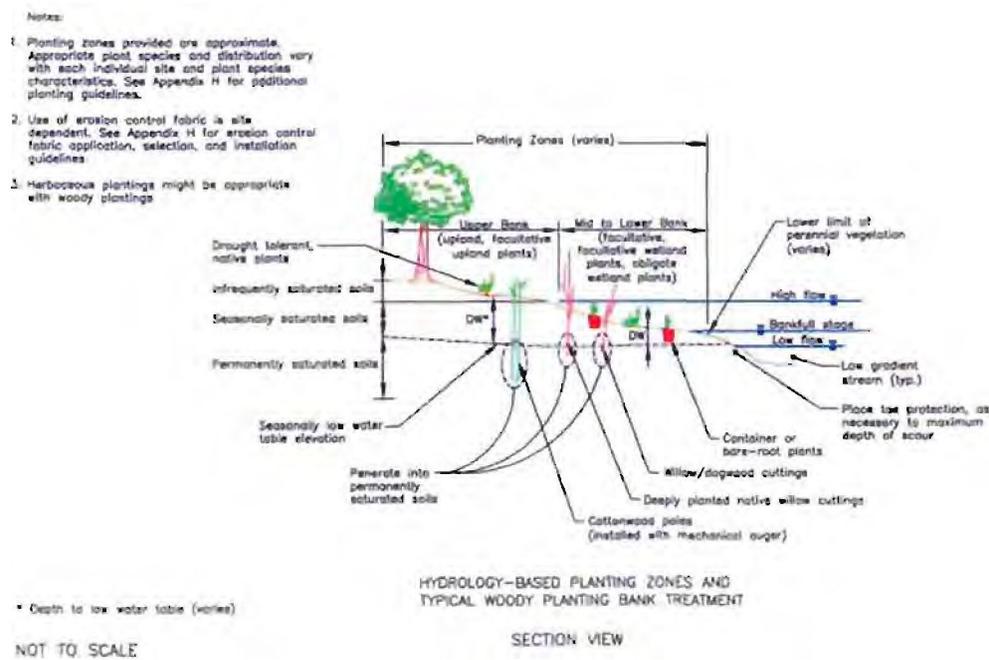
Conceptual drawing of woody plantings (WDFW, 2003).
